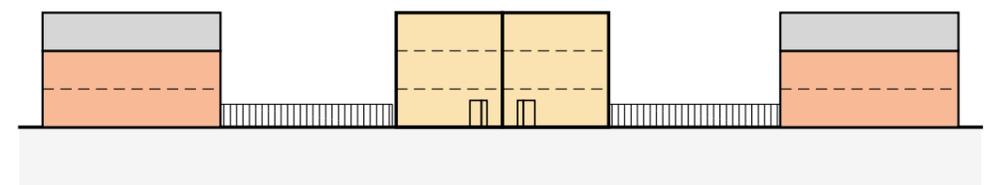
Window positions should be carefully considered to avoid direct overlooking of the first 10m of neighbouring gardens, and the height of new buildings should ensure that adequate daylight and sunlight reaches existing habitable rooms and rear gardens.
